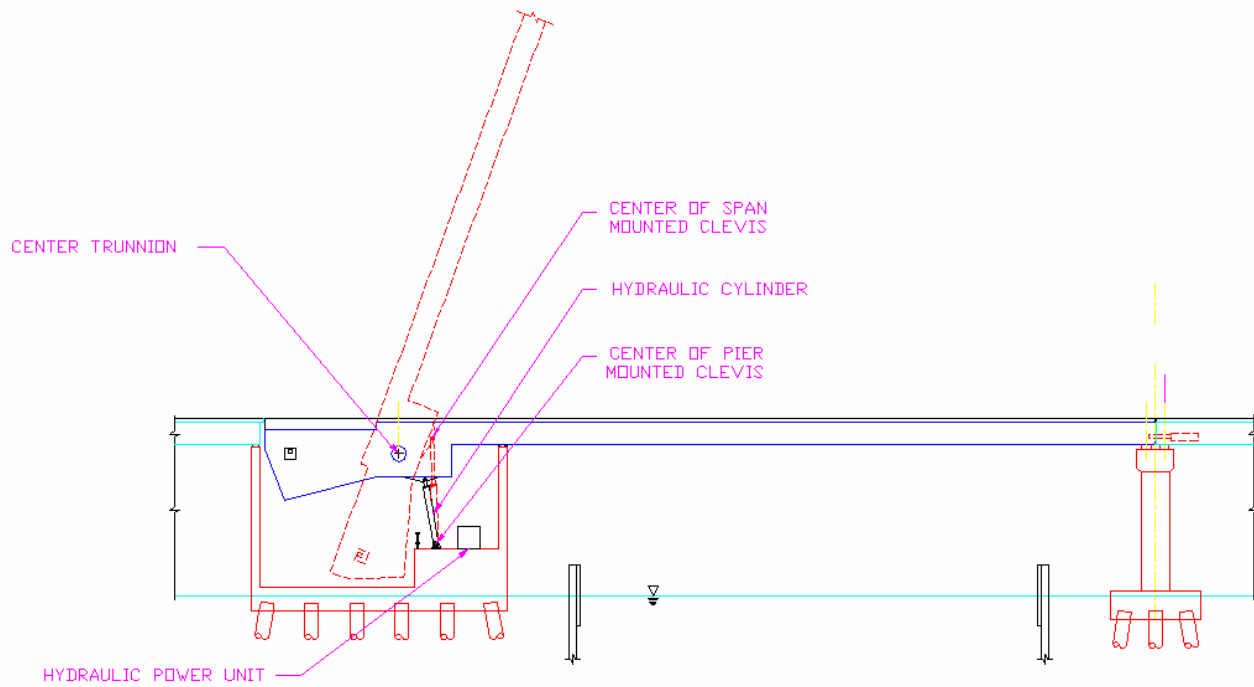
Elevation Sketch Showing Hydraulic Cylinder Operated Trunnion Bascule
